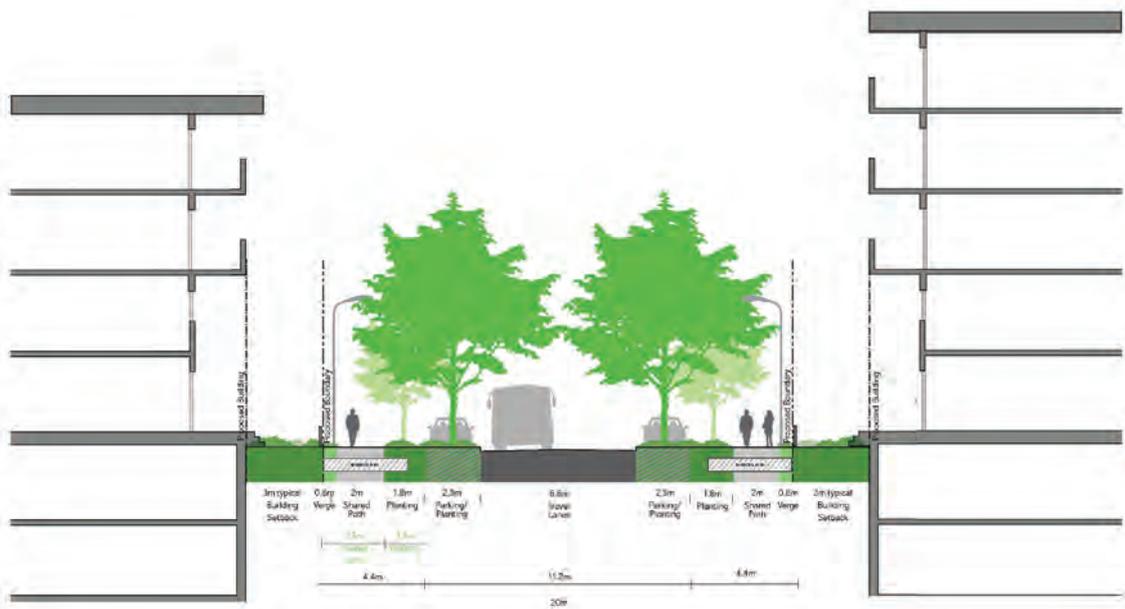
Indicative Street Section (Local Street with Bus Route, 20m)
